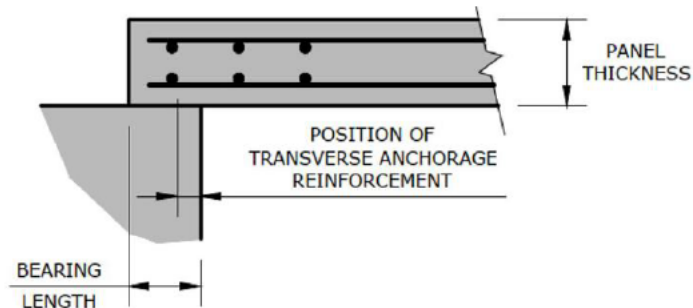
The transverse and longitudinal anchorage reinforcement requirements over supports;
